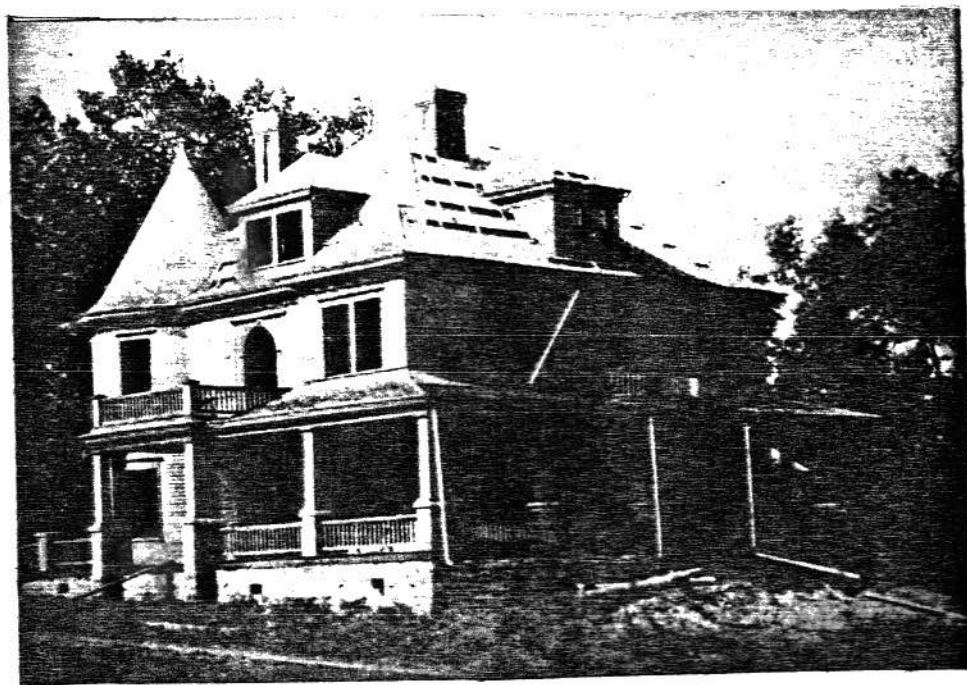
Walter F. Kilpatrick house. Unfinished, 1914.
